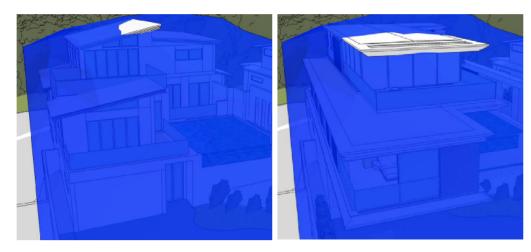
A and 2B on the following page, show the 8.5m building height plane, as measured from the previously existing ground level of the site, prior to excavation for the existing dwelling. Figure 2A shows in white, the reduced extent of the existing dwelling that extends above this height plane, measured on this basis. Figure 2B, shows in white the reduced extent of the new dwelling, after alterations and additions, that extends above the 8.5m building height plane measured on this basis.
